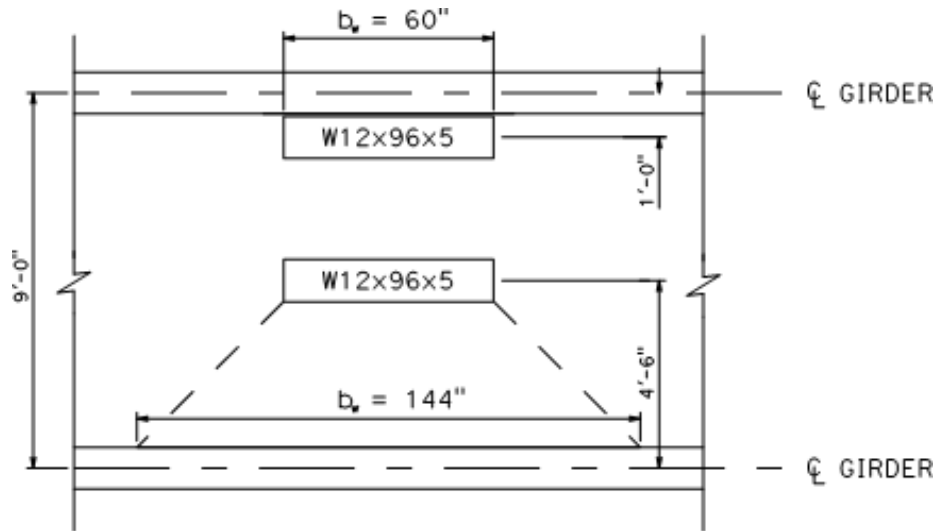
One-Way Shear at Mid-Span and Near Girder of Transverse Deck Slab.
